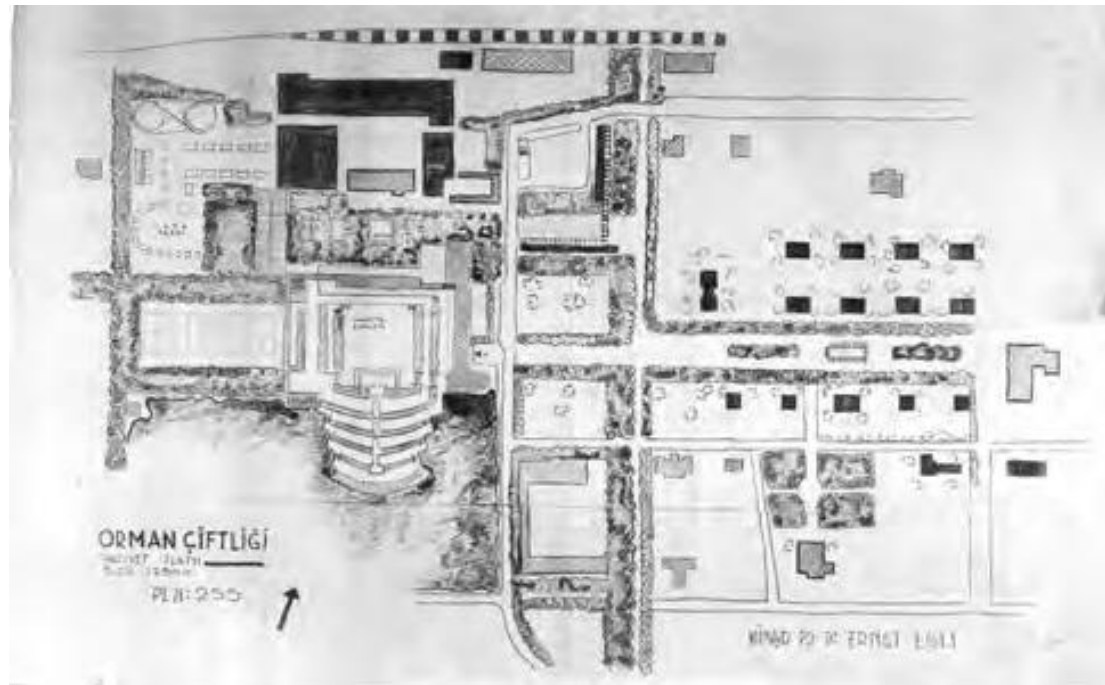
Site Plan Drawing (ALPAGUT,2010:246)
